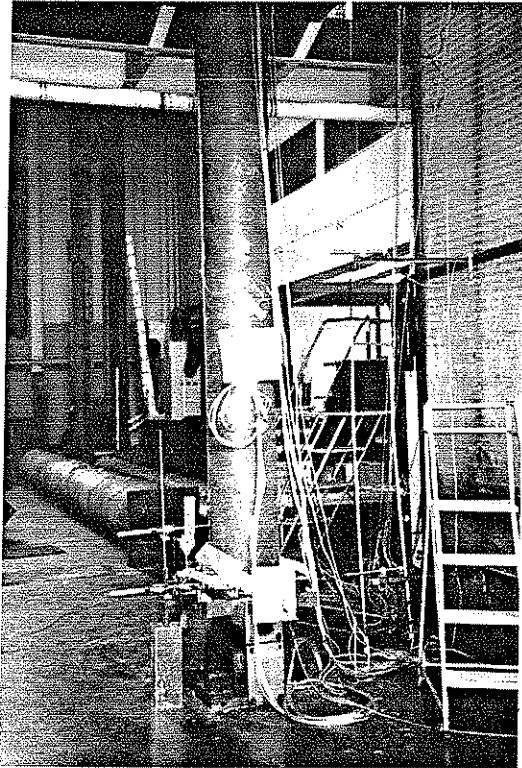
Instrumentation - Transverse and Longitudinal LVDTs, and Rotation Gage at End of Tube. (Cylindrical End Fixture)
